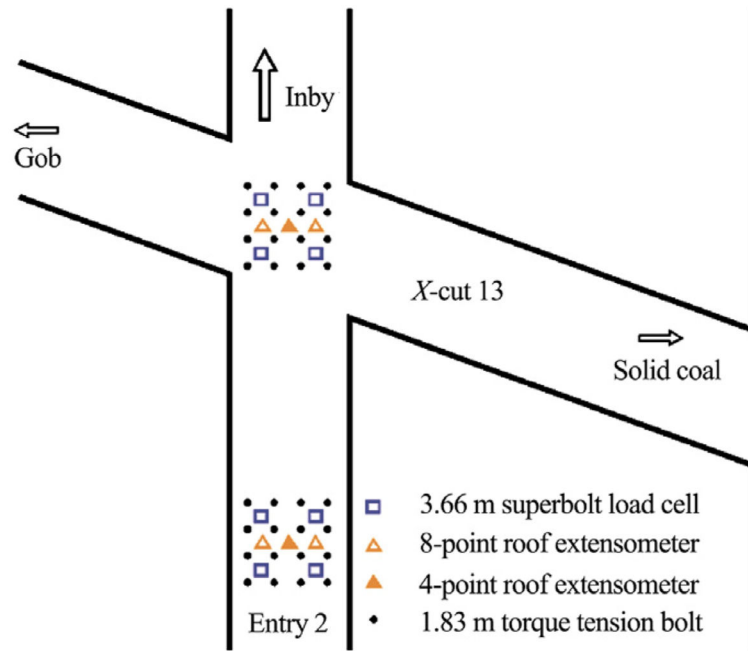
Instrumentation site showing location of roof extensometers and load cells.
